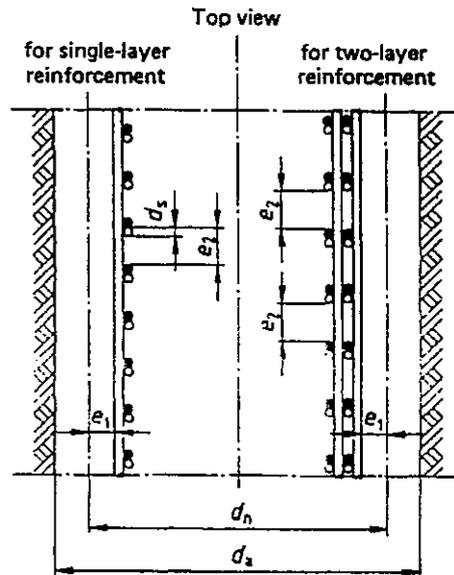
Clear flow width required to ensure a sufficient concrete cover and to protect the reinforcement system at joints
